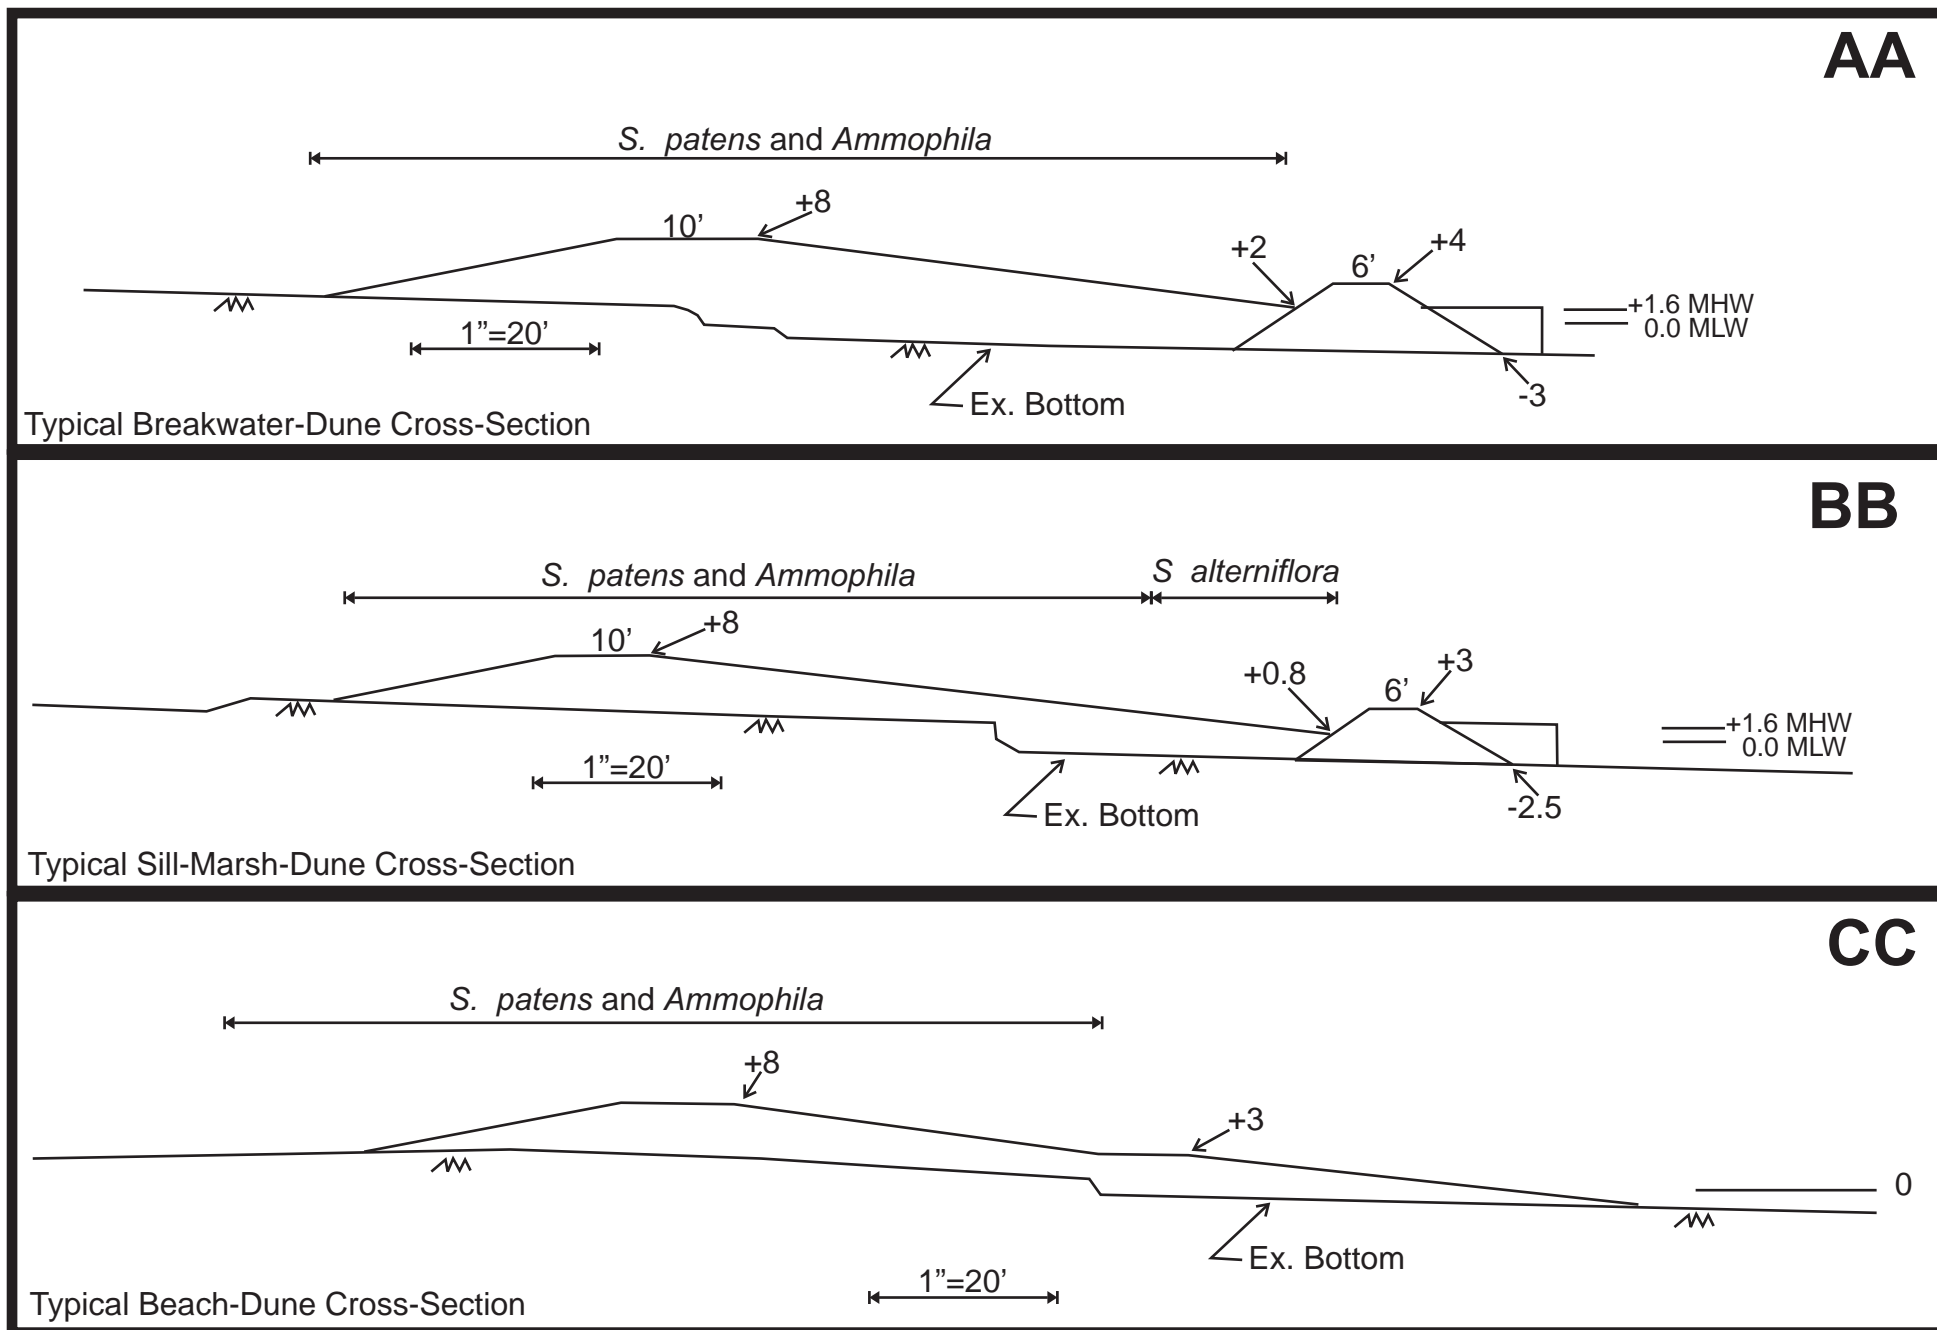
Typical cross-sections of proposed structures in the Uppards west coast shoreline management plan.
